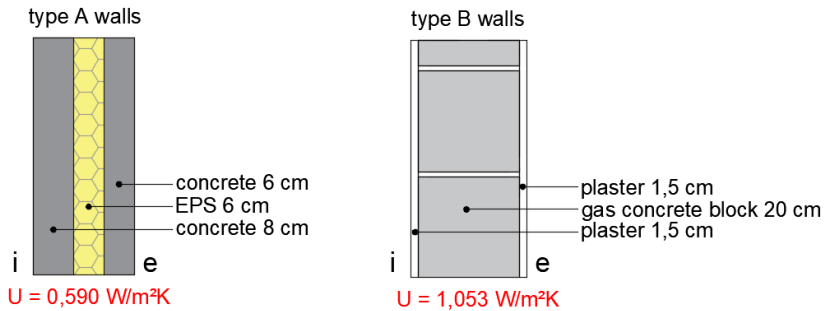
Analysed external building walls: type A – facade panel, type B – wall within the loggia
